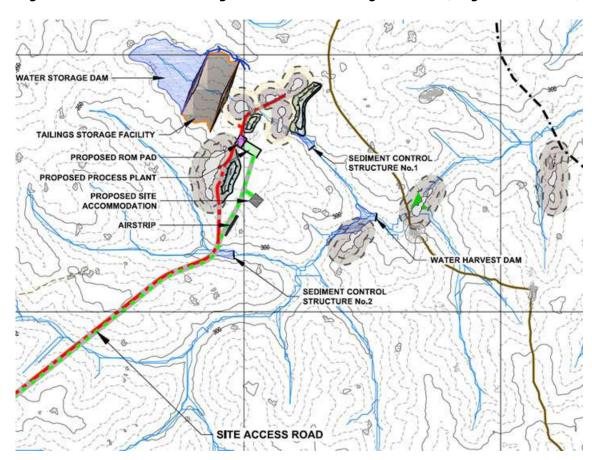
General Arrangement for Water Storage Facilities (Knight Piésold 2023)
